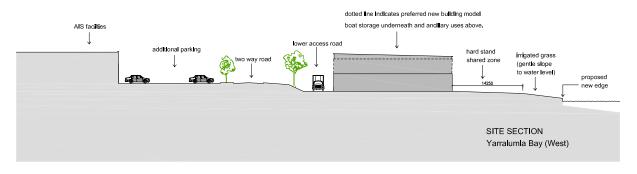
INDICATIVE SECTION OF PREFERRED BUILDING FORM AND ORIENTATION.
